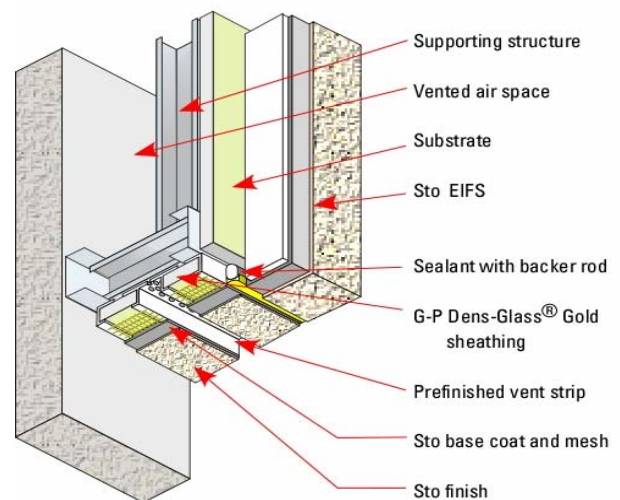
Typical soffit detail with Sto Quik Gold System for Soffits
